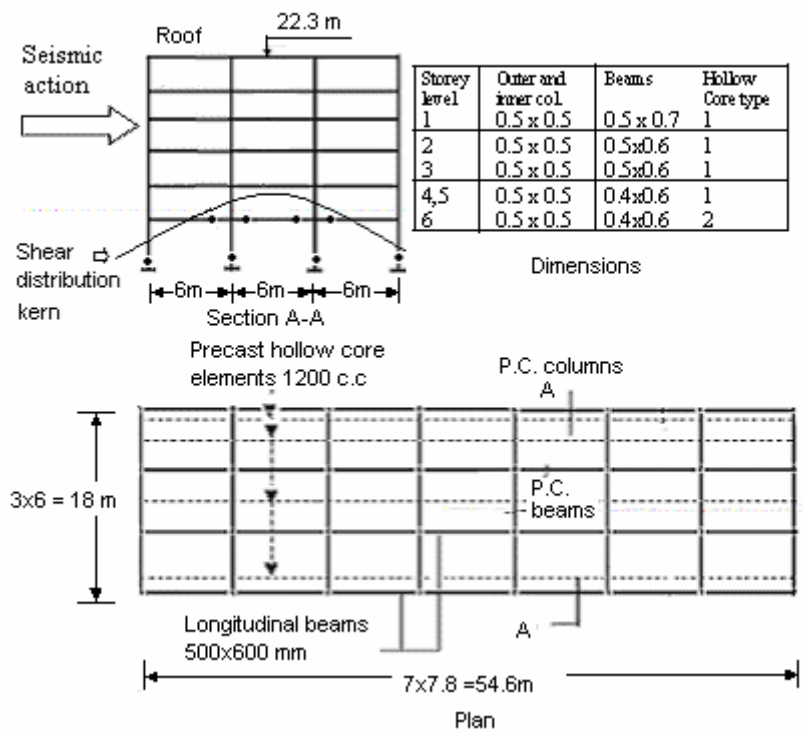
The six storey building, geometry, columns and beam dimensions
